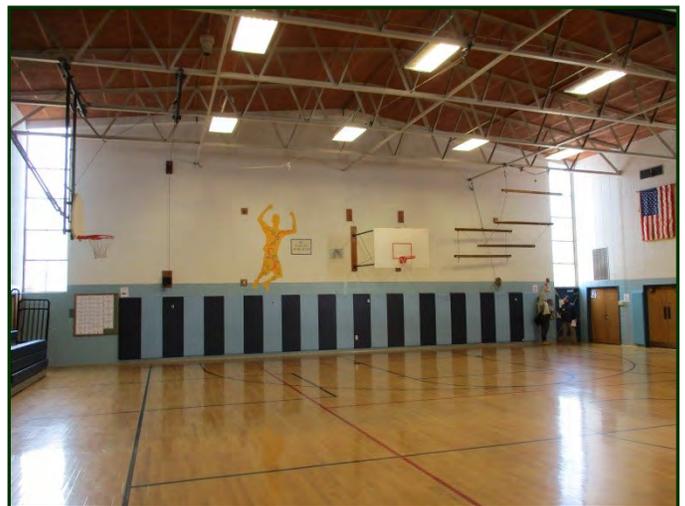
Gymnasium with stained strip wood flooring, exposed underside of structure above & painted CMU walls
